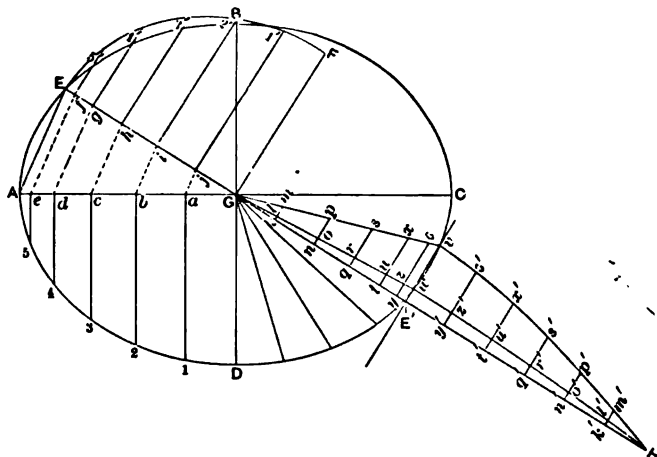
Covering of an Ellipsoidal Dome with Vertical Gores.
